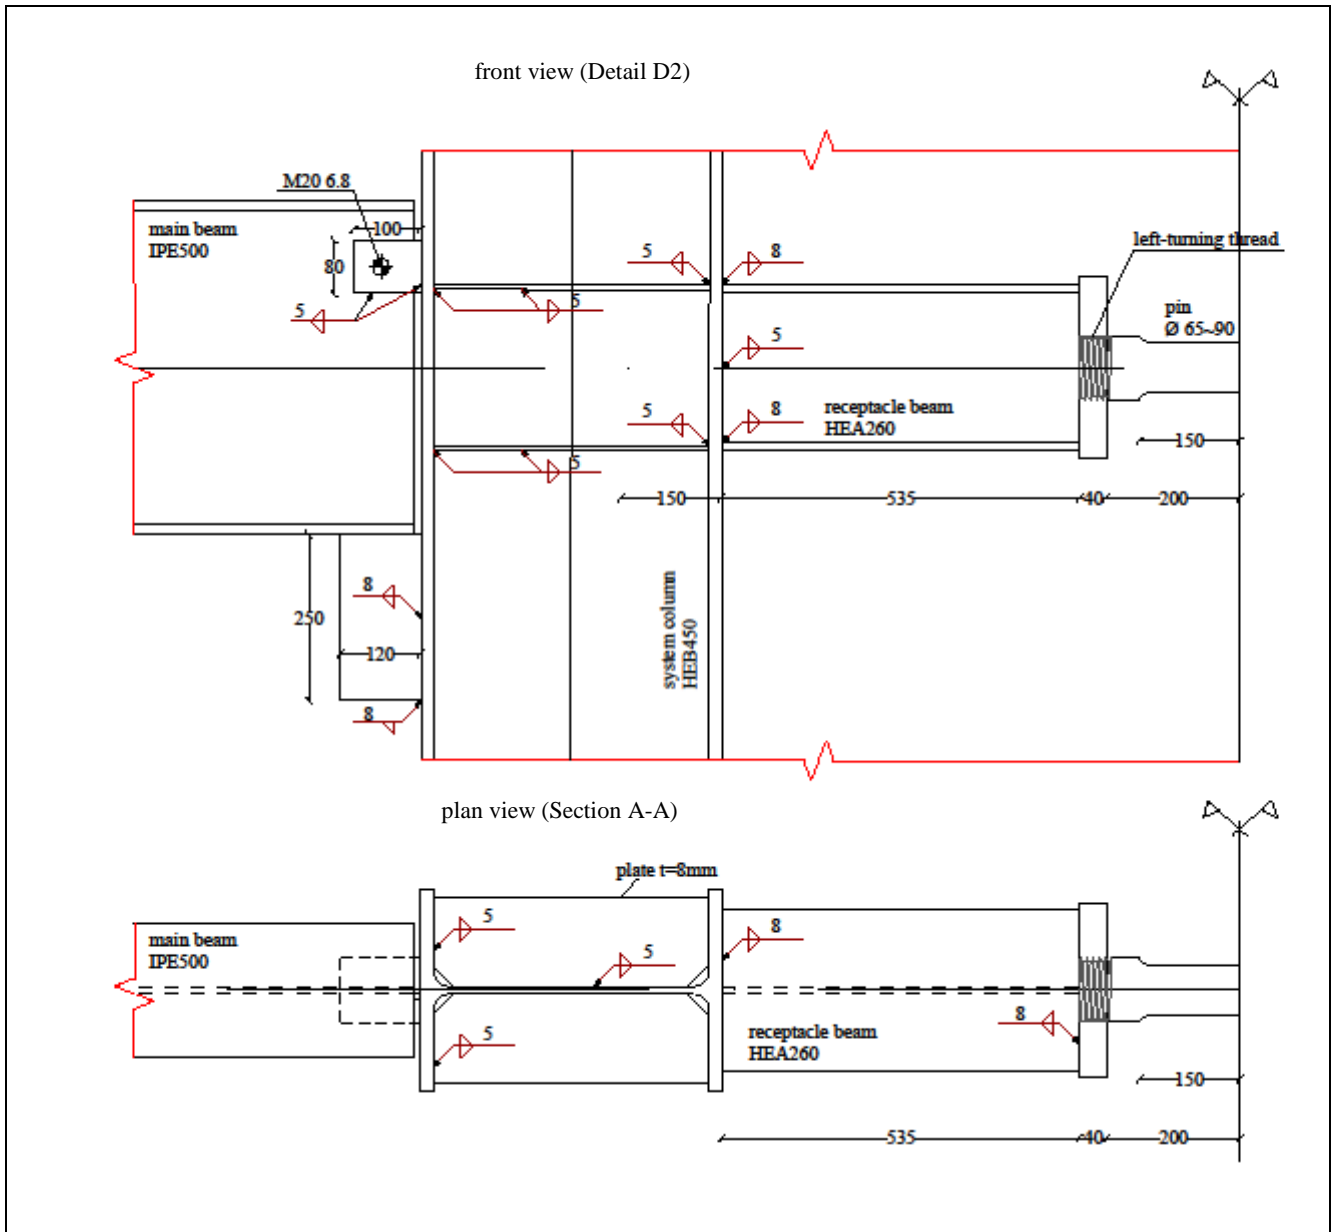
Side view and plan view of a typical FUSEIS beam link
